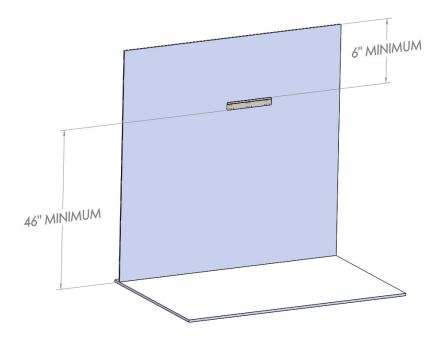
Cleat Mount to Wall for Wall Mounting the PK-220
